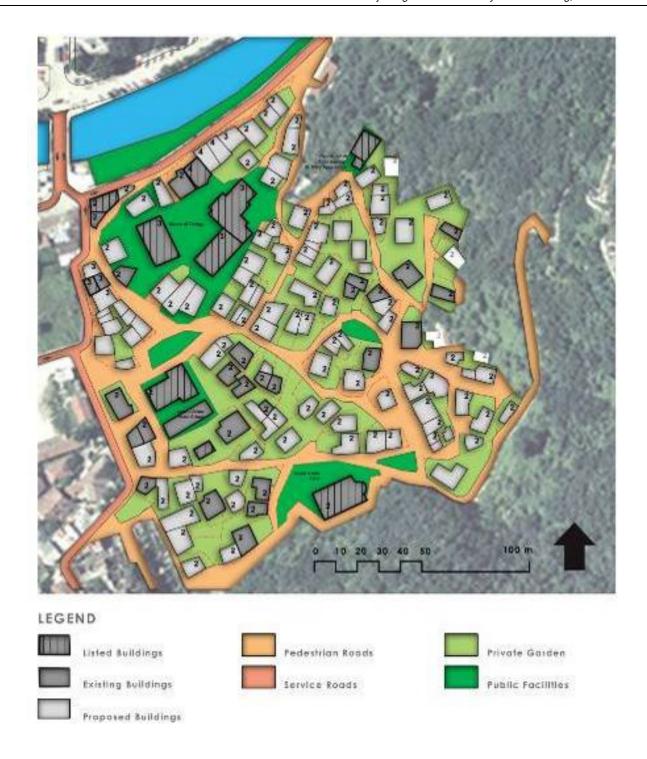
Plan design for Nenkalaja including listed, existing and proposed buildings
